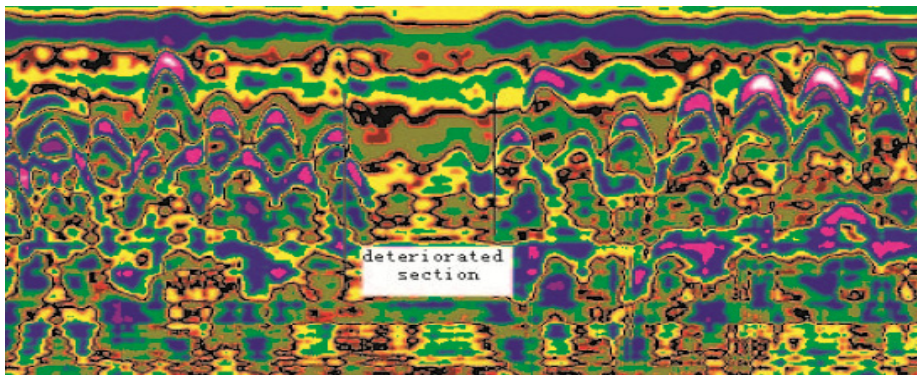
Example of a 2D ground penetrating radar image for good and corroded rebar (He et al. 2009).
